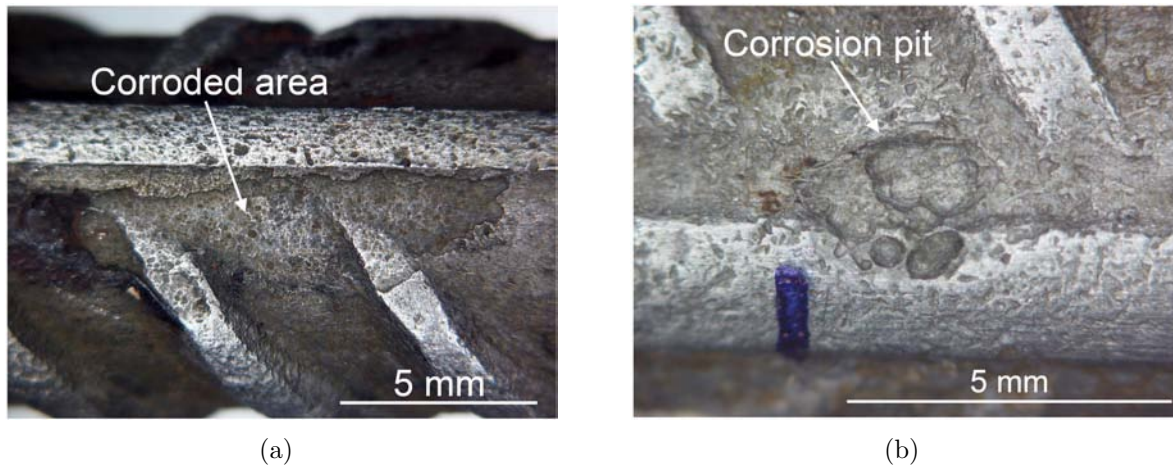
Images of corroding areas in the standard rebar from (a) Beam 2 (0.3 mm crack width) and (b) Beam 6 (1.2 mm crack width). (Author's photos)
